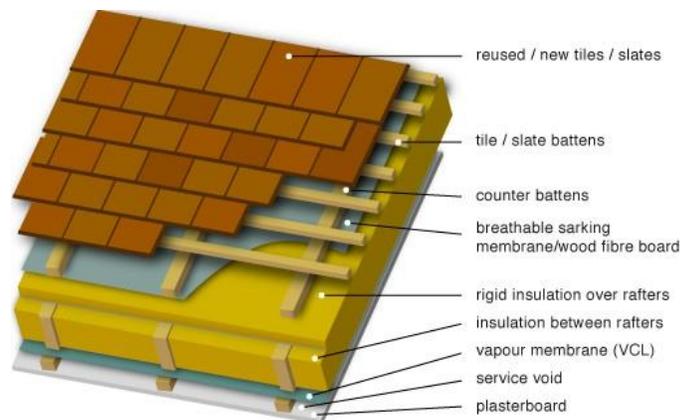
Roof insulation placed between and above the rafters. (Source: www.greenspec. co.uk building design), (Chinazzo, 2013-14)
